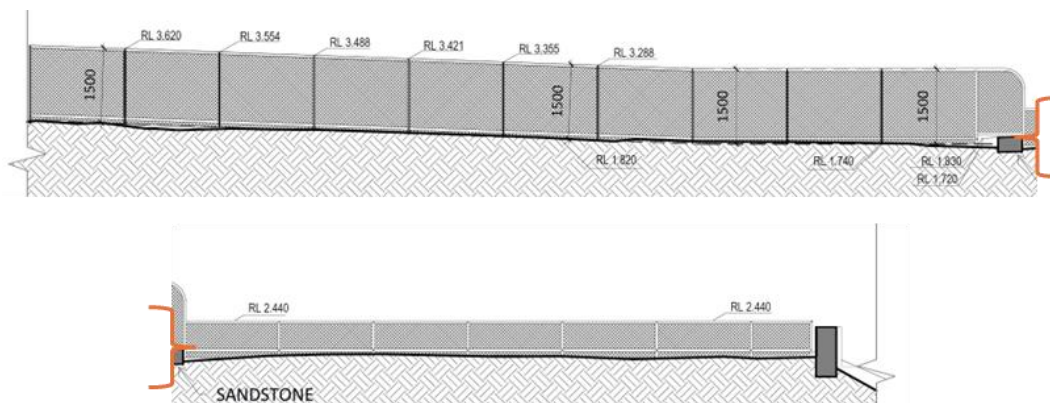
Extract of southern elevation drawing showing the proposed fence in two parts - the taller part (top image) adjacent to the existing building, and shorter part (bottom image) towards the foreshore area
